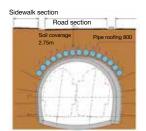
Cross-section figure of the Isahaya Tunnel's national road area
